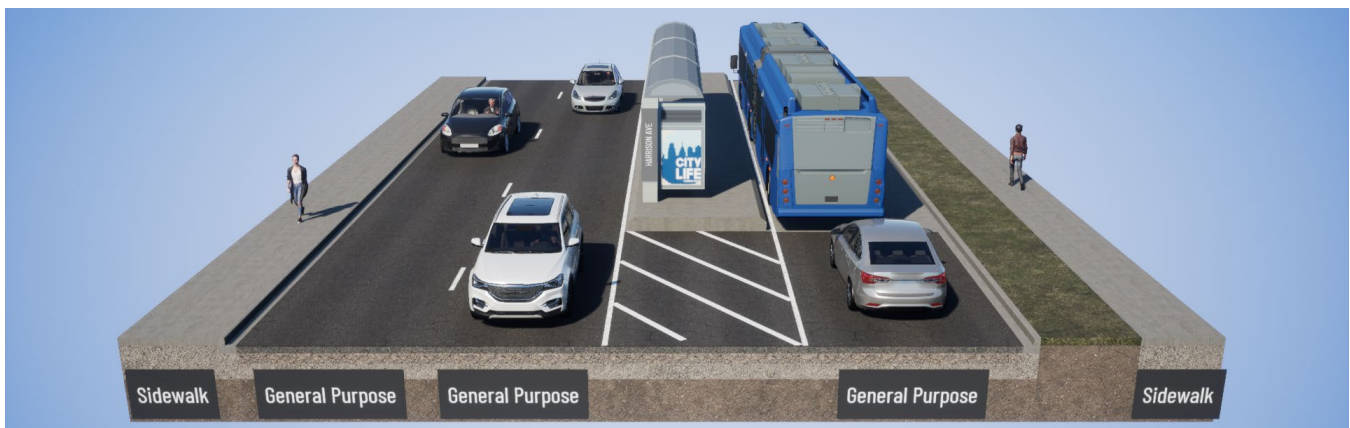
Harrison Avenue at Proposed Downtown Cary Multi-Modal Center
